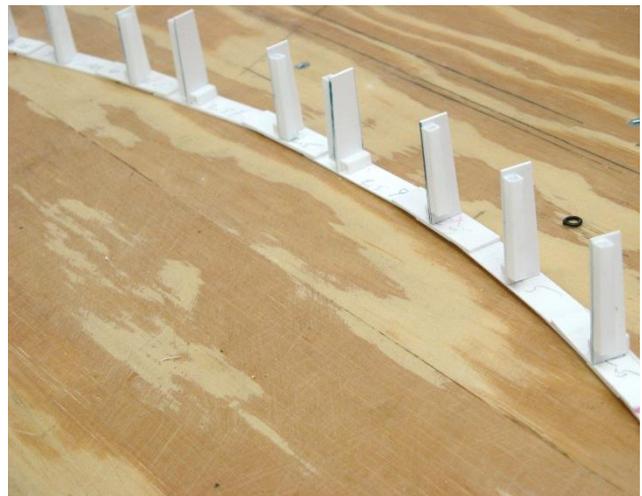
Frame showing the backside support pieces for the concrete panel wall
